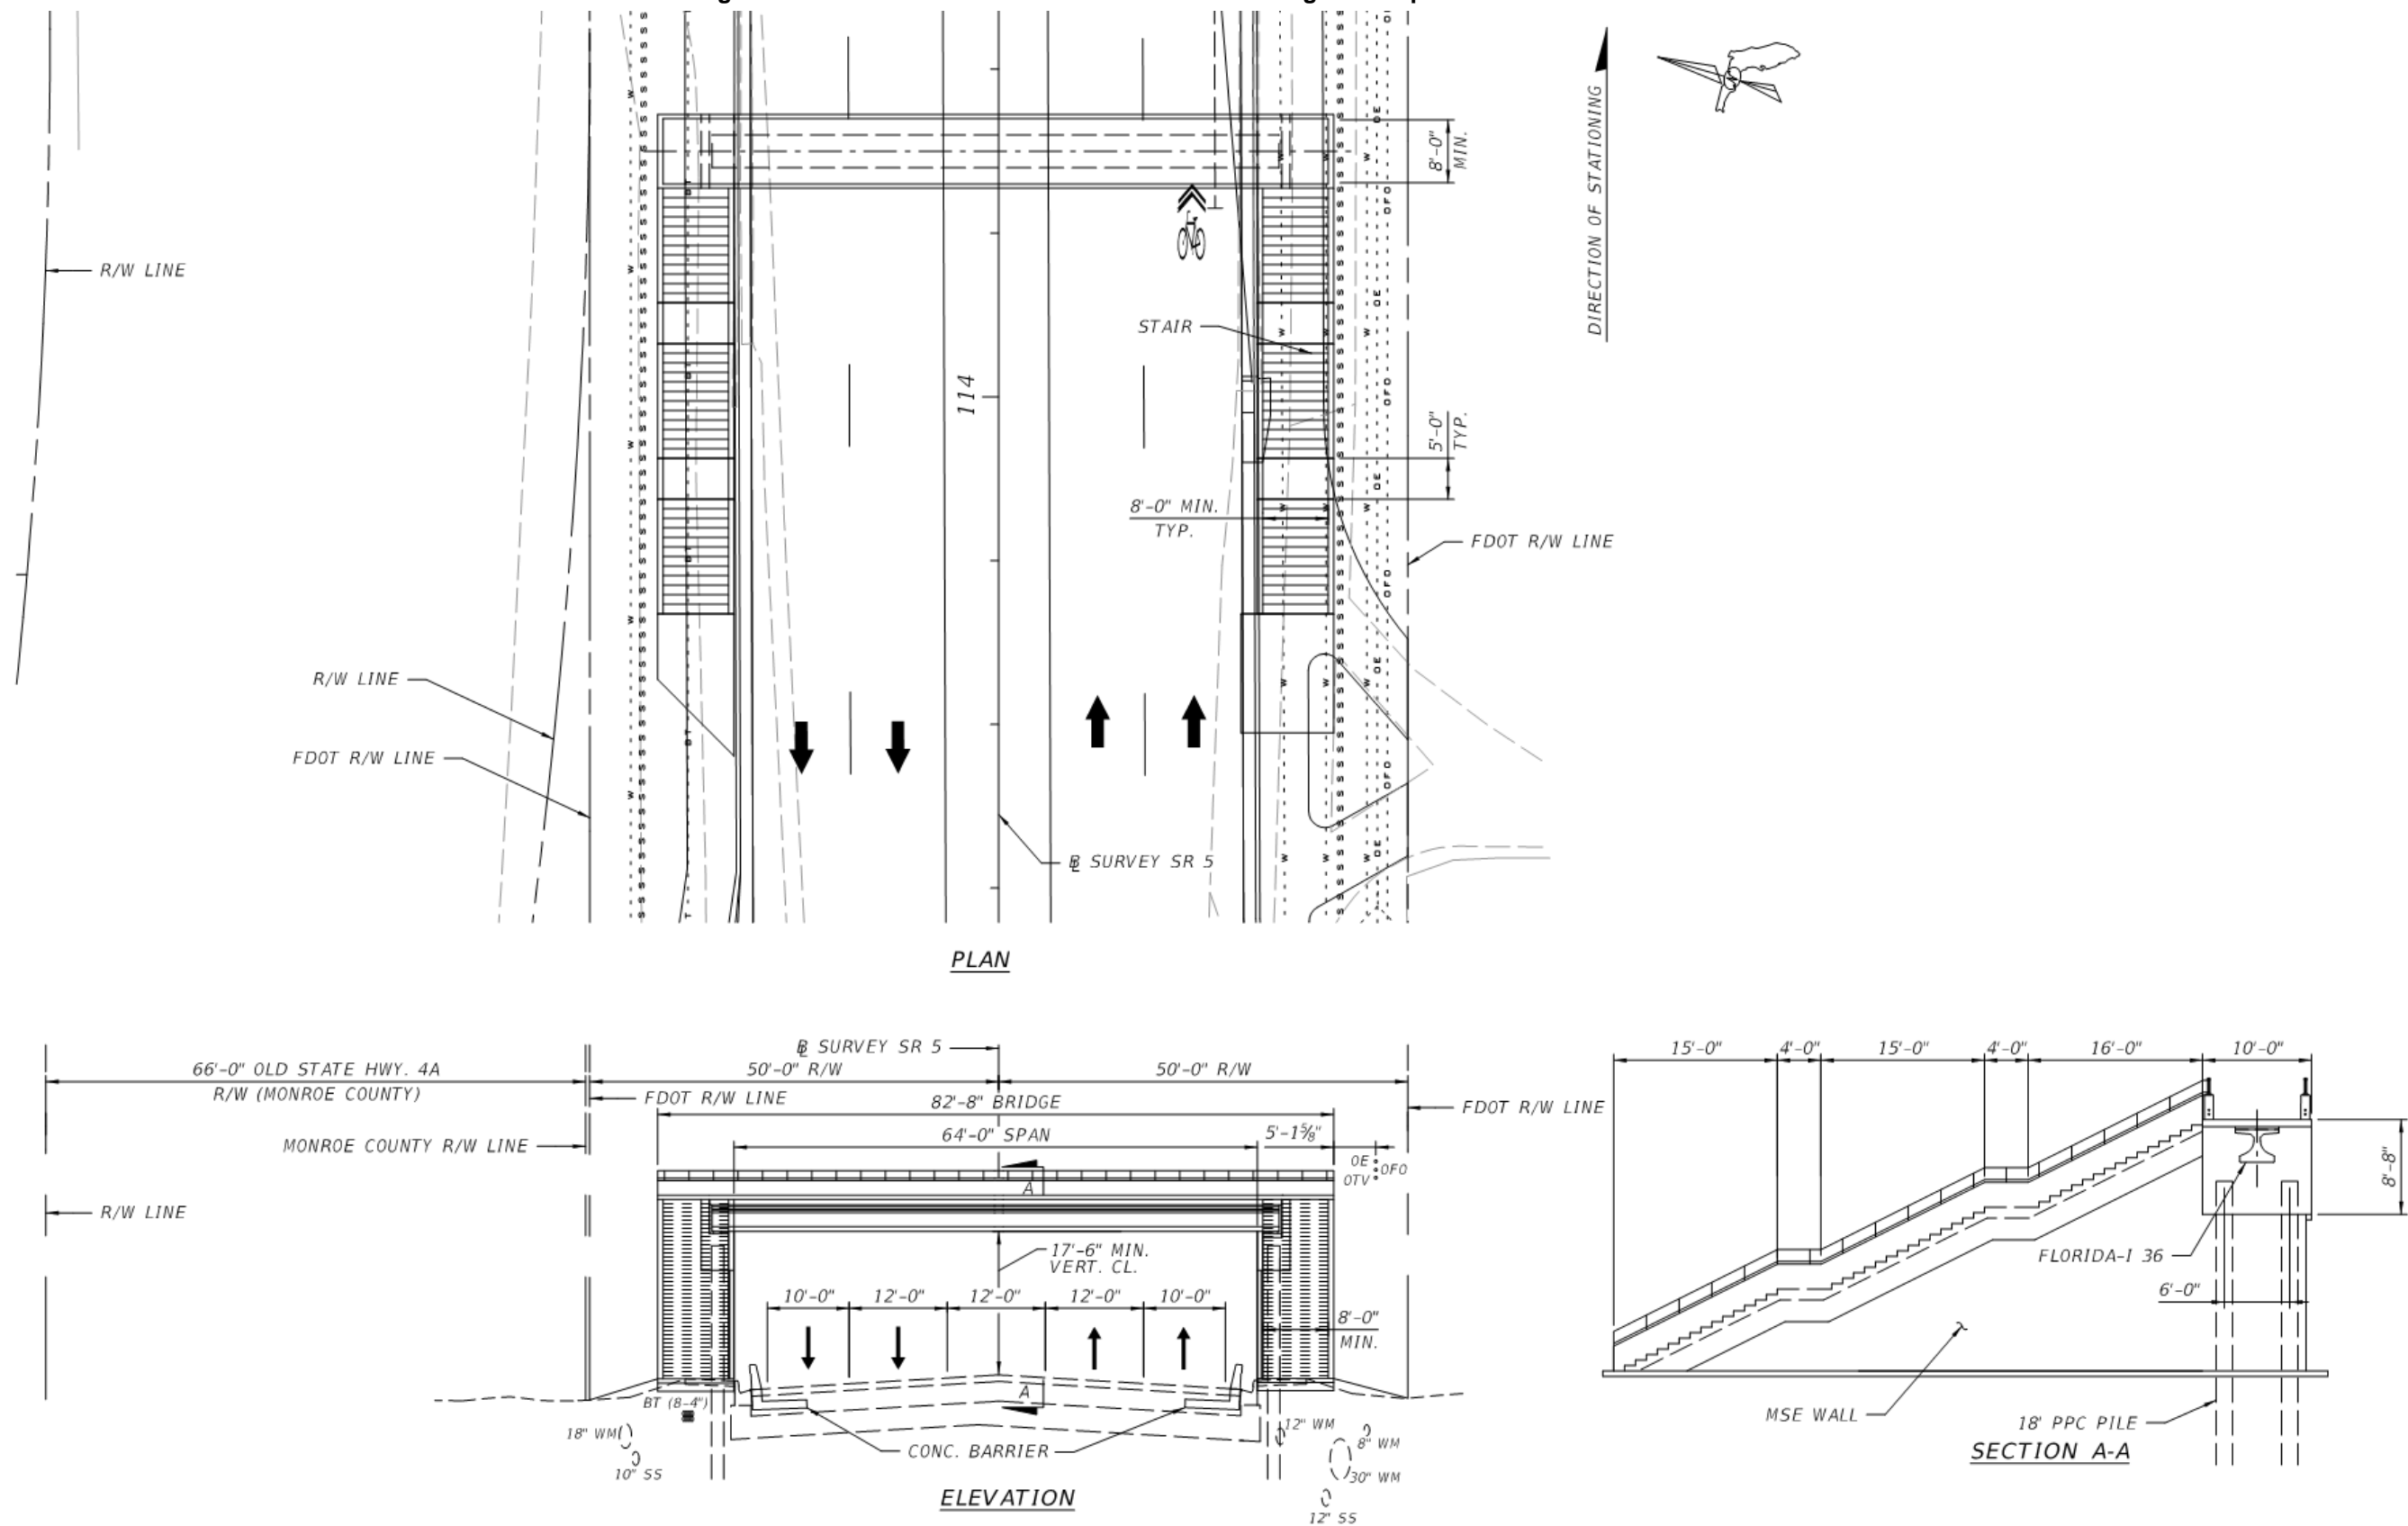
Location 2B Permanent Pedestrian Bridge Concept – Typical Section
